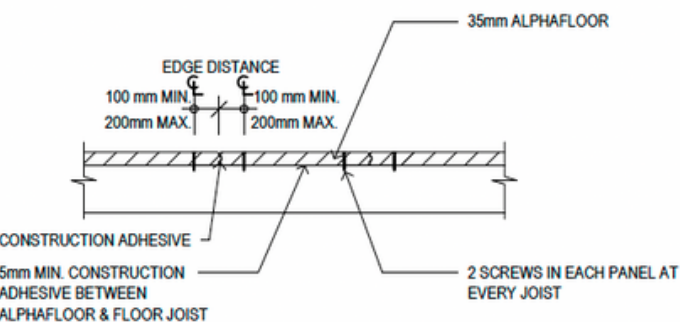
ALPHAFLOOR® Fixing to Timber Joists
